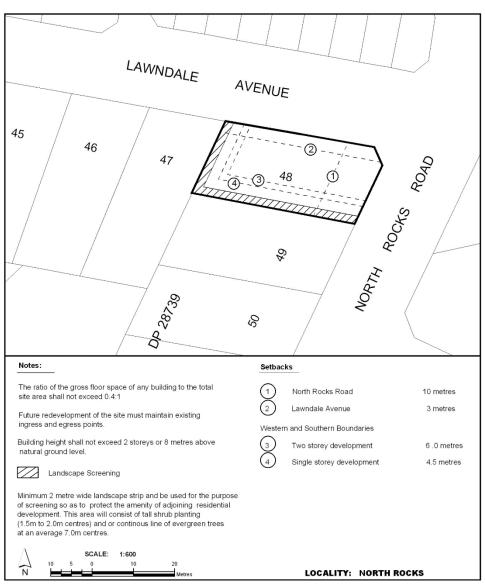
Setback requirements for land on the corner of Lawndale Avenue and North Rocks Road, North Rocks (355 North Rocks Road, North Rocks)
